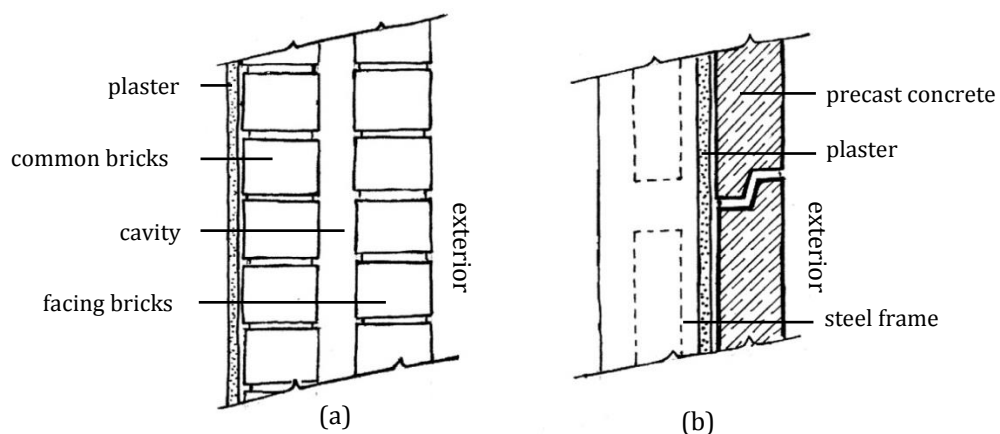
Detail of the traditional (a) and light-weight construction (b).
